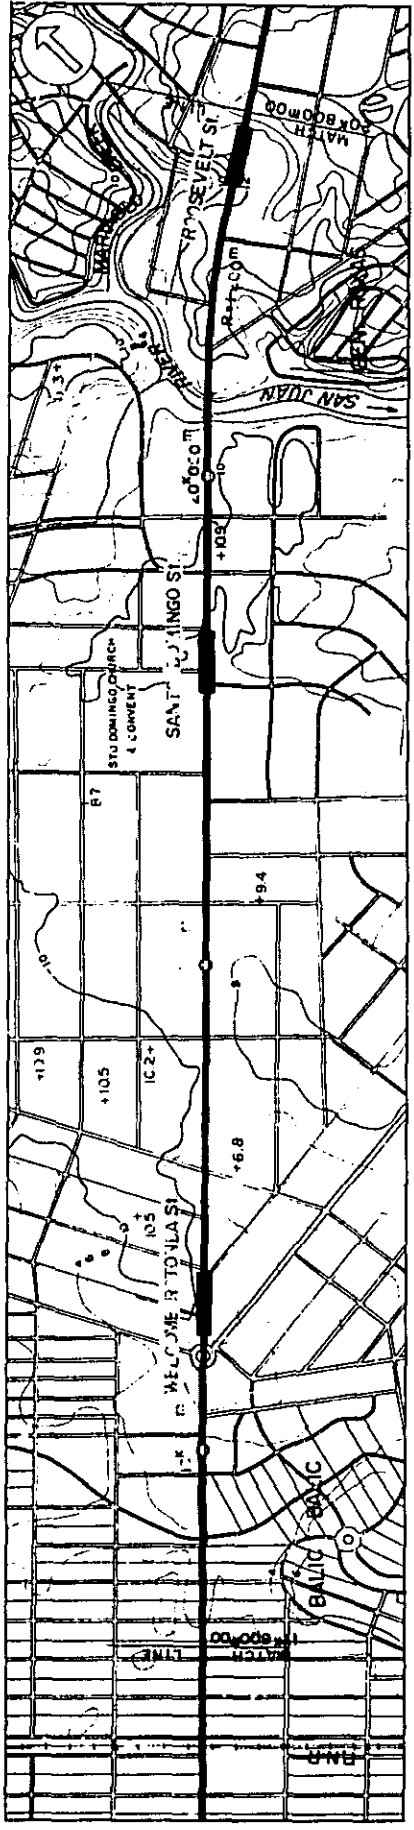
Plan and Profile of Recommended Alternative (6)
